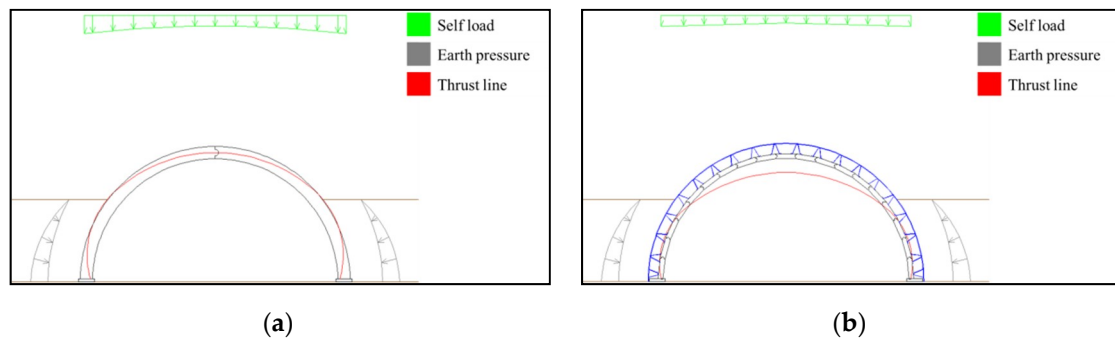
Thrust line of arch bridge under self-weight and lower-side earth pressure (during construction): (a) a precast, three-hinged concrete arch and (b) a precast outrigger panel arch.
